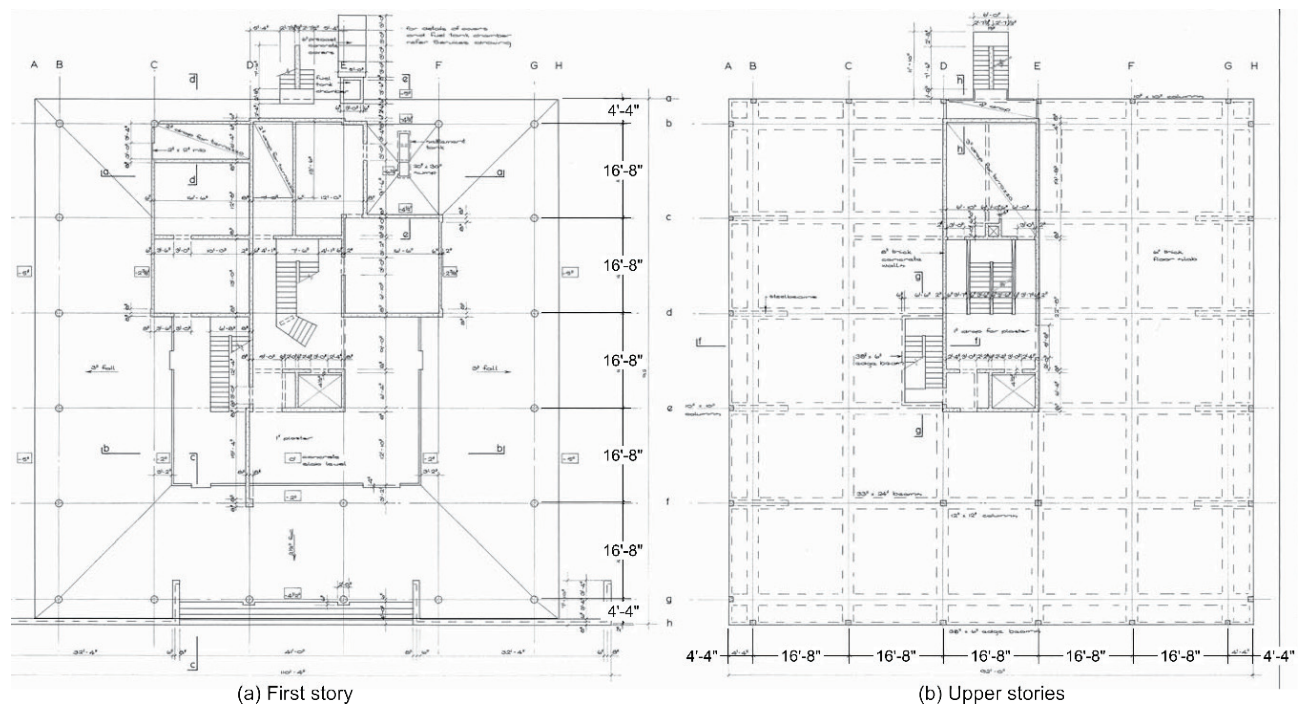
Building plan showing (a) first story and (b) upper stories (adapted from Beca, 2011).
